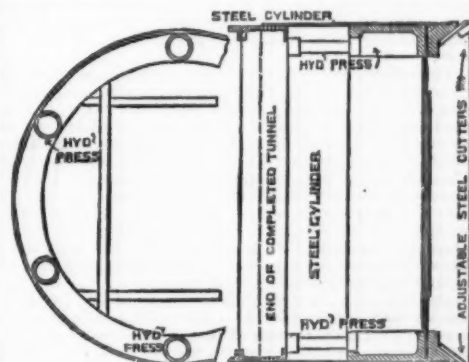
SECTION OF TUNNEL END AND SHIELD.
